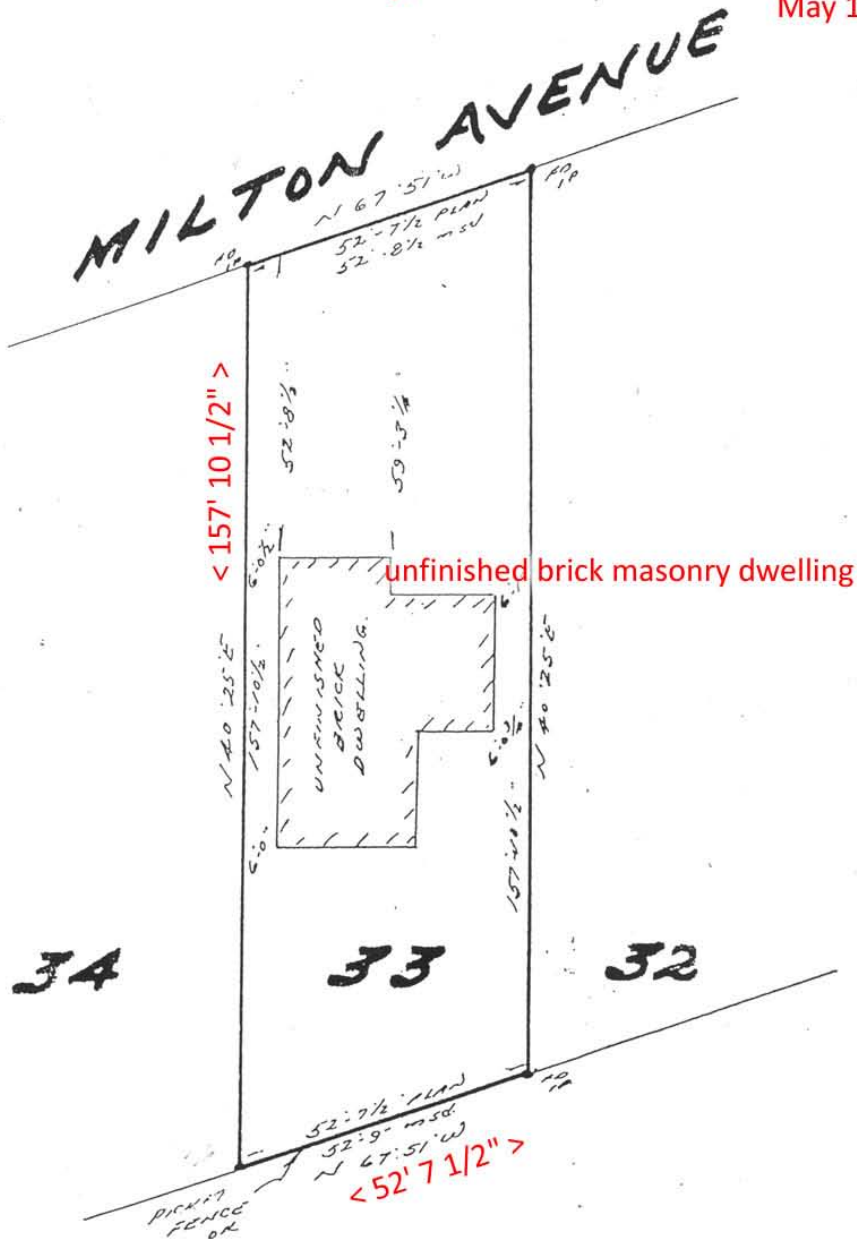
Section of above Plan of Subdivision, showing Lot 33.
